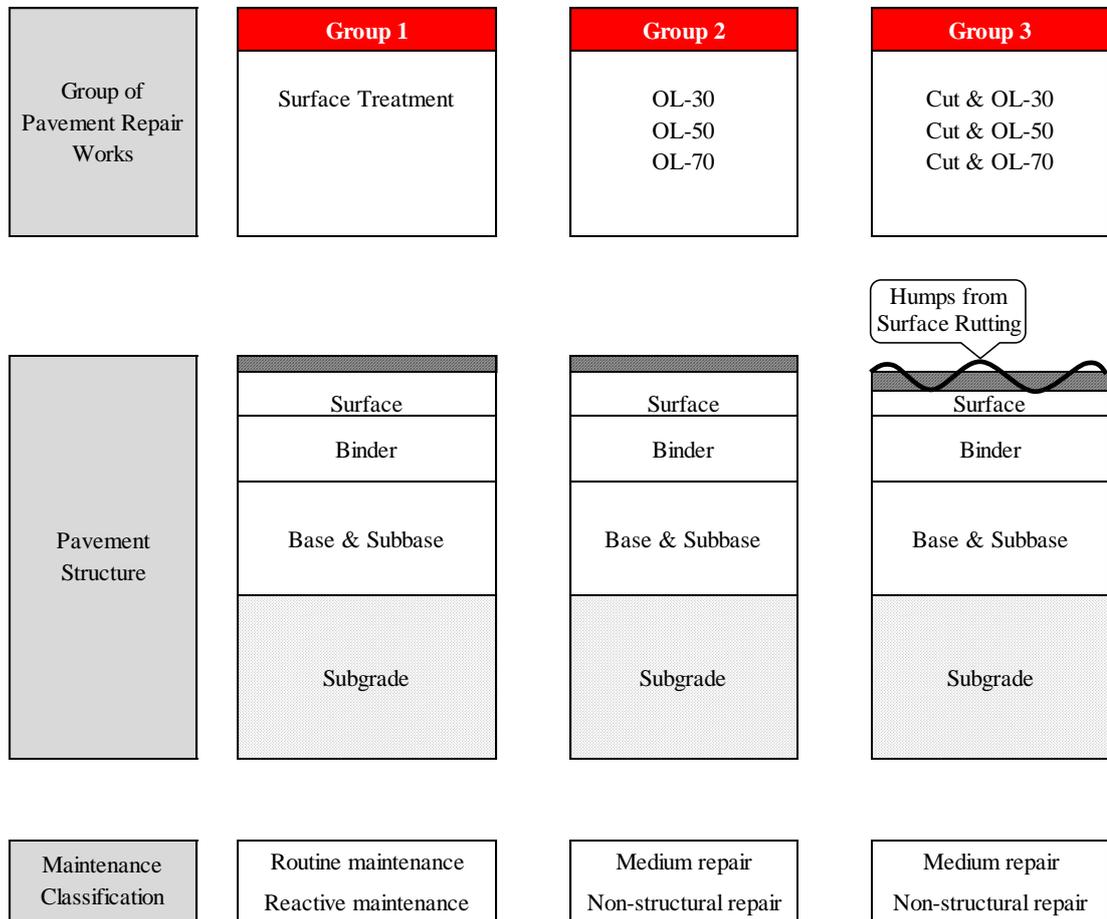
Common Repair Works for Pavement in Vietnam (1/2)
